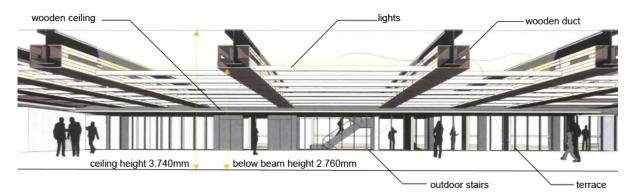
c - Detail of floor height; Dimensions in [mm]
